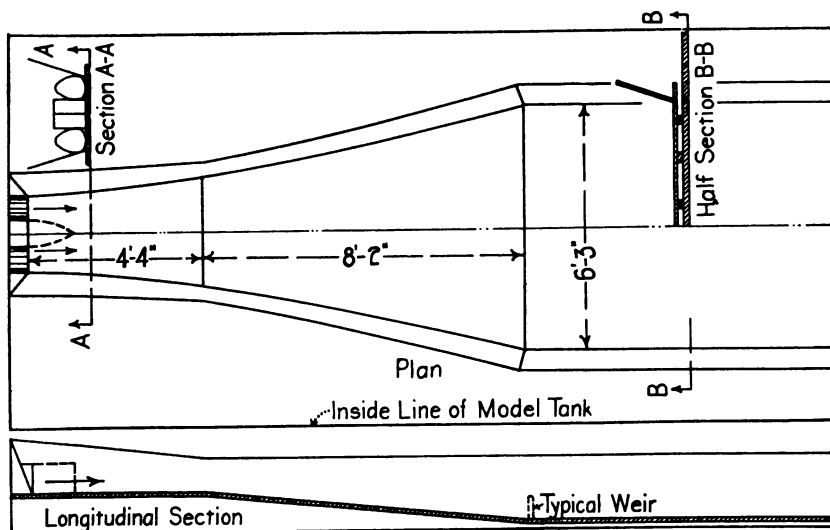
PLAN AND SECTIONS OF SECOND MODEL OF GERMAN-TOWN DAM OUTLET, SERIES A, SMOOTH FLOOR.
